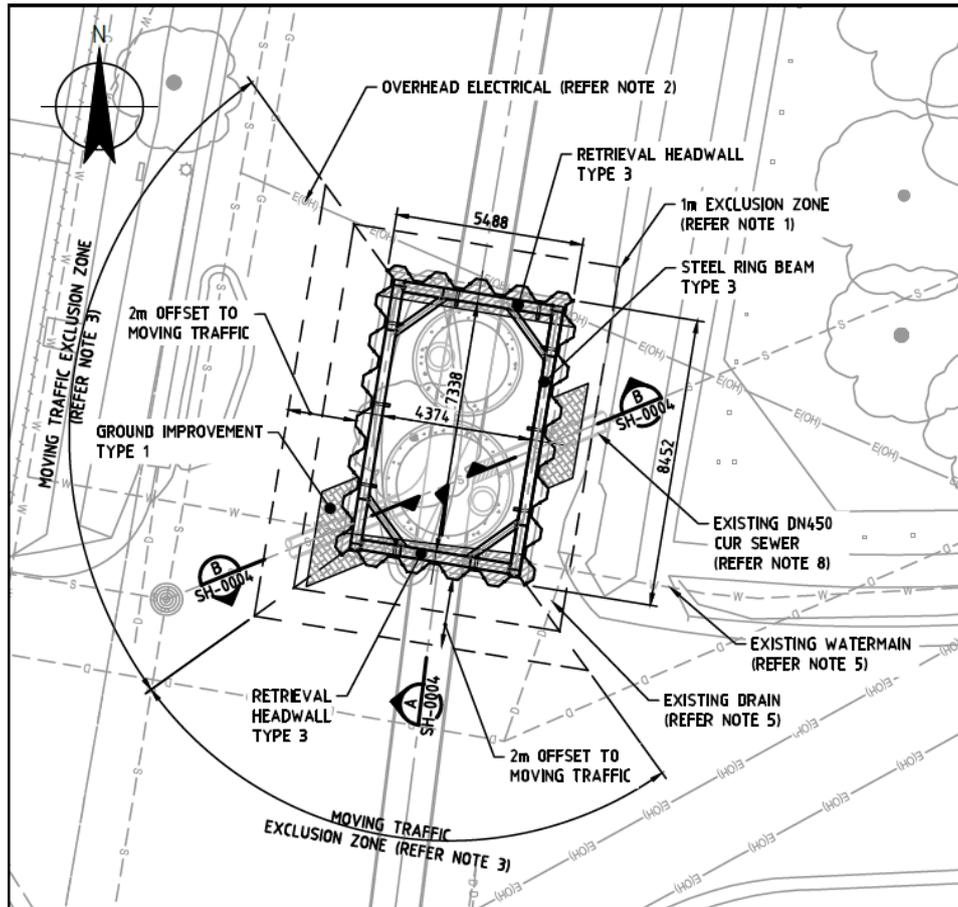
Woollongabba Trunk Sewer Upgrade Sheet Pile Shaft General Arrangement
